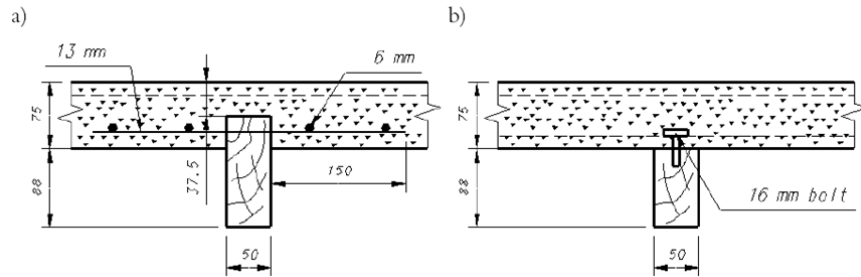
cross-sections of timber-concrete composite beams with horizontal shear connectors (a) and vertical shear connectors (b) (after Murthy 1984) (dimensions in mm)
